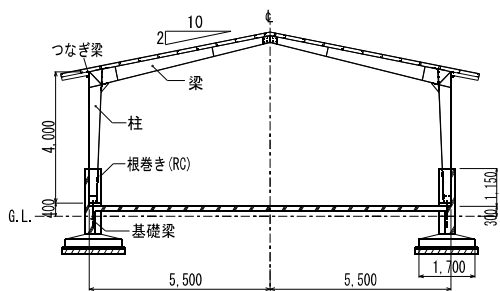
Sectional Plan of the Practical Factory (Unit [mm])
